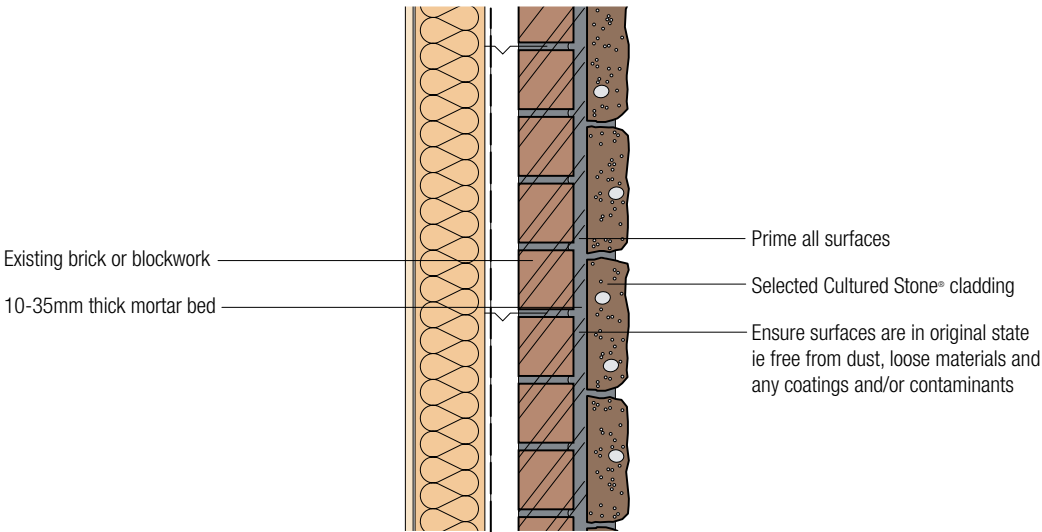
Brick or Block Work Veneer - Section (Dwg # CS-05.02)
